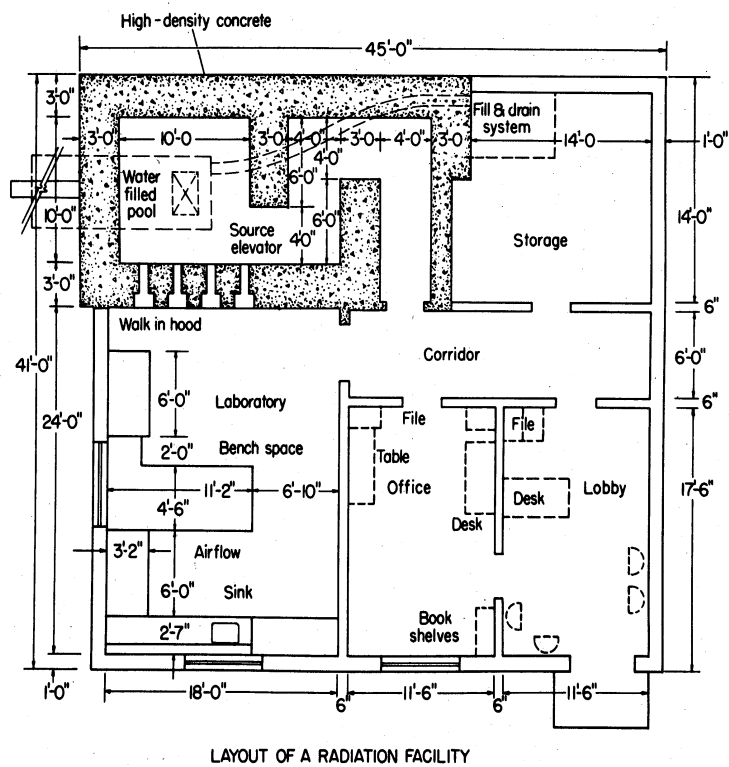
Floor plan of a proposed concrete-shielded gamma-irradiation hot cell
